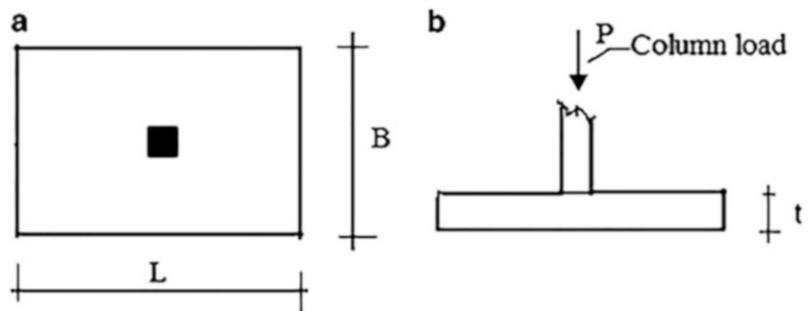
Single footing—axial loading. (a) Plan. (b) Elevation
